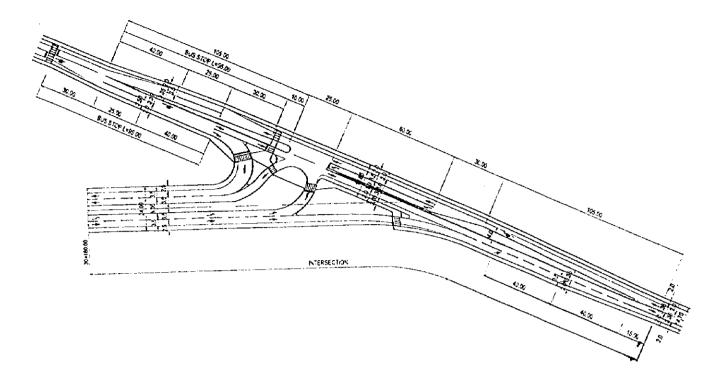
TYPICAL LAYOUT OF 3-LEG INTERSECTION (Without Frontage Road)
